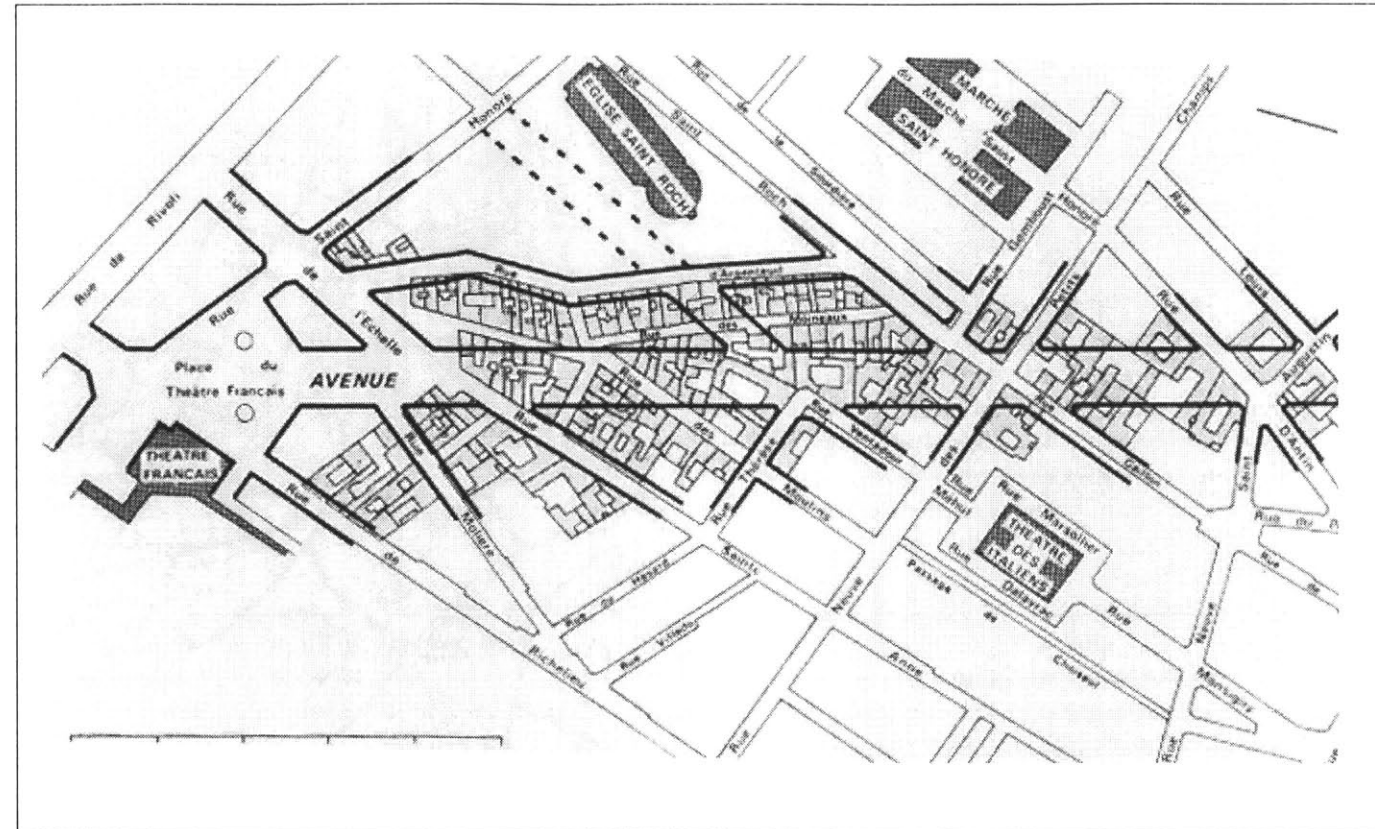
Haussman's plan for the Avenue de L'Opéra.
